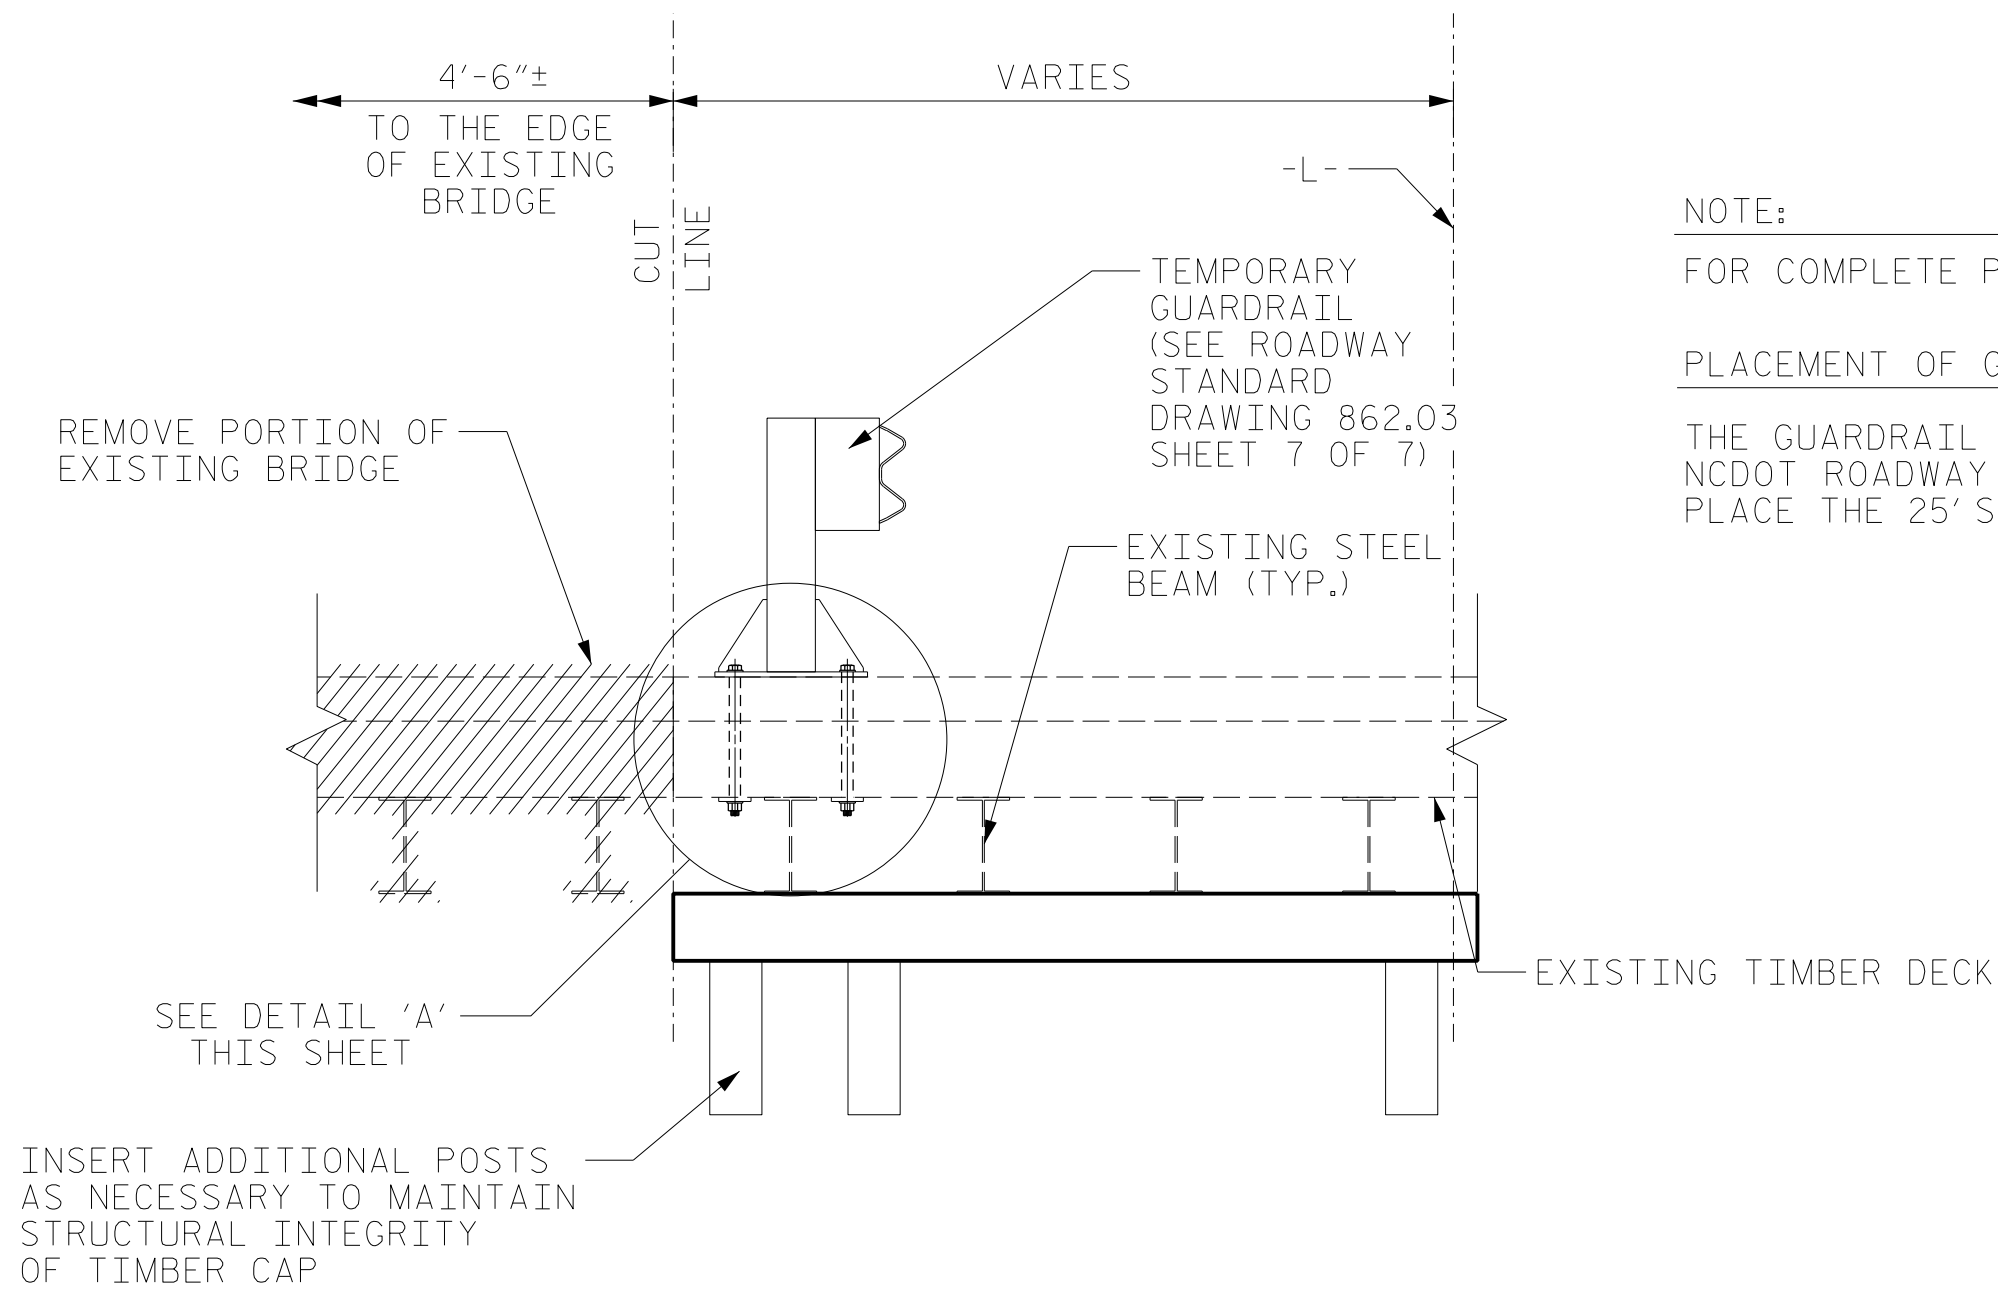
PLATE DETAIL FOR TEMPORARY GUARDRAIL ON EXISTING BRIDGE
